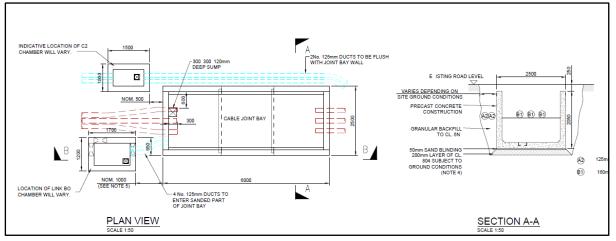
Extract from planning drawing No. 60634578-ACM-DR-CE-037 Typical Joint Box Details.
